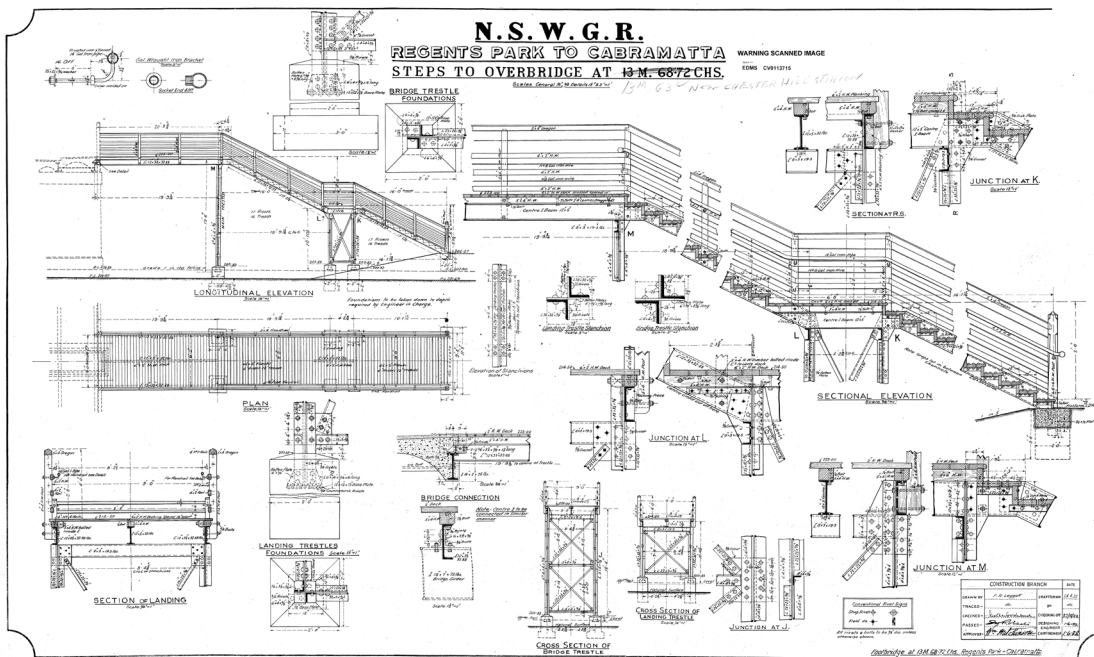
NSWGR Regents Park to Cabramatta – steps to overbridge at Chester Hill Railway Station, c.1922 (Virtual Plan Room).
